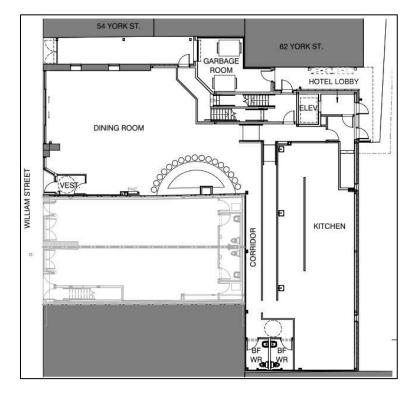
Exhibit C: Ground Floor Plan of the Proposed Redevelopment.
